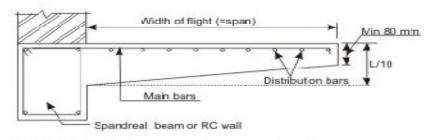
(b): Cantilever slab from a spandreal beam or wall
